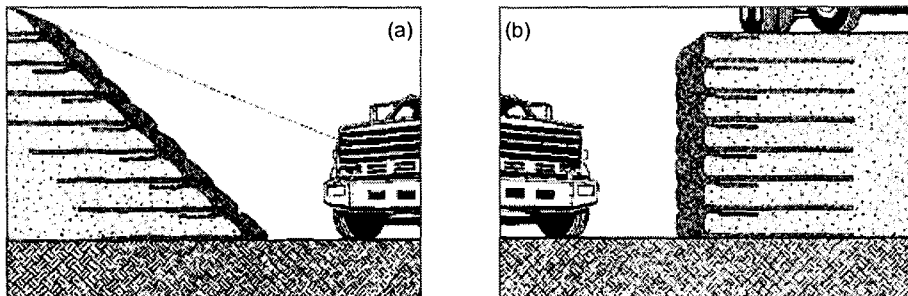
Examples of reinforced soil applications; (a) steepened slope, (b) retained wall
